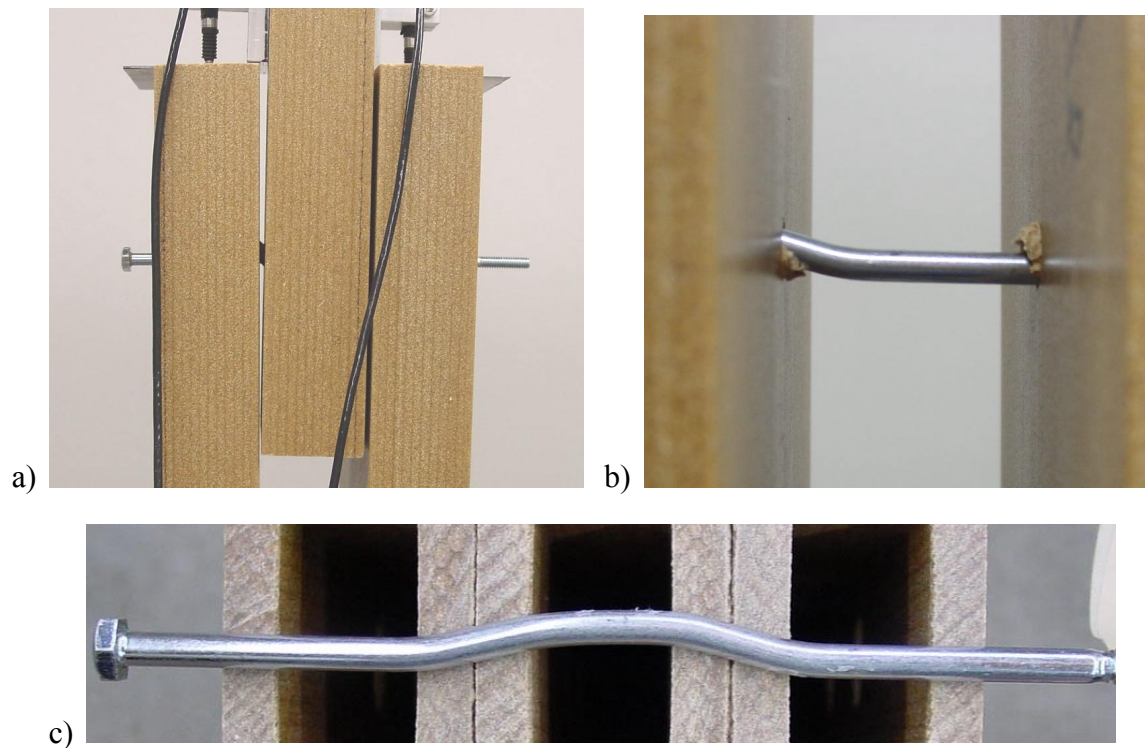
PVC Mode IV connections a) Entire connection b) Dowel yielding in side member c) Approximate location of dowel and walls during testing
